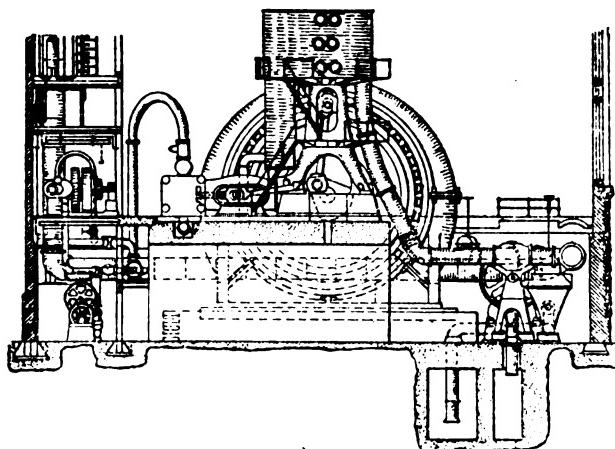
CROSS-SECTION OF ENGINE ROOM SHOWING OLD 7,000 KW. RECIPROCATING SETS.
